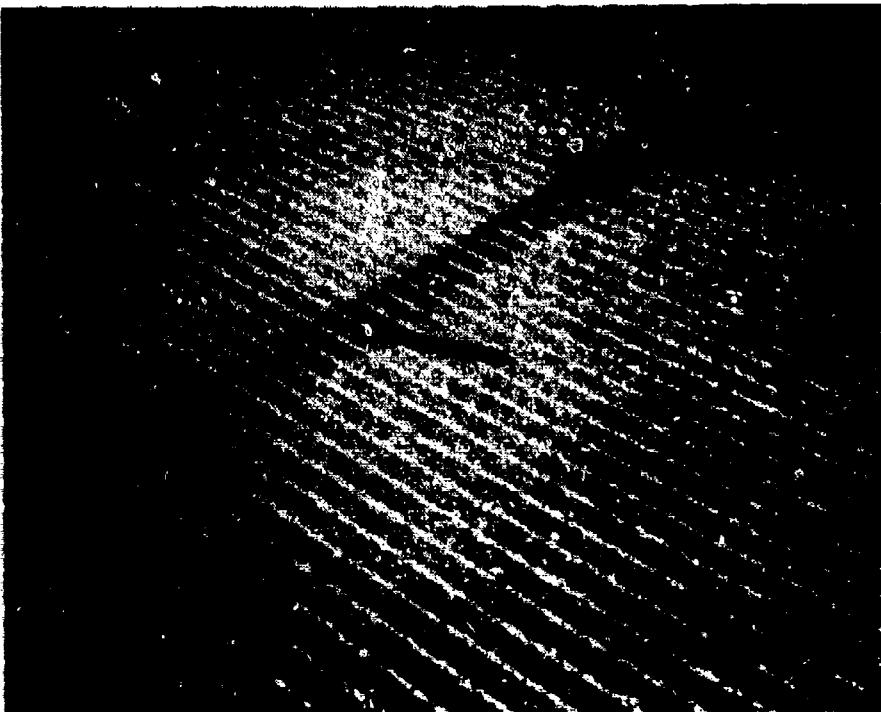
PAVEMENT GROOVES ON HOUSTON HOBBY RUNWAY 17-35
